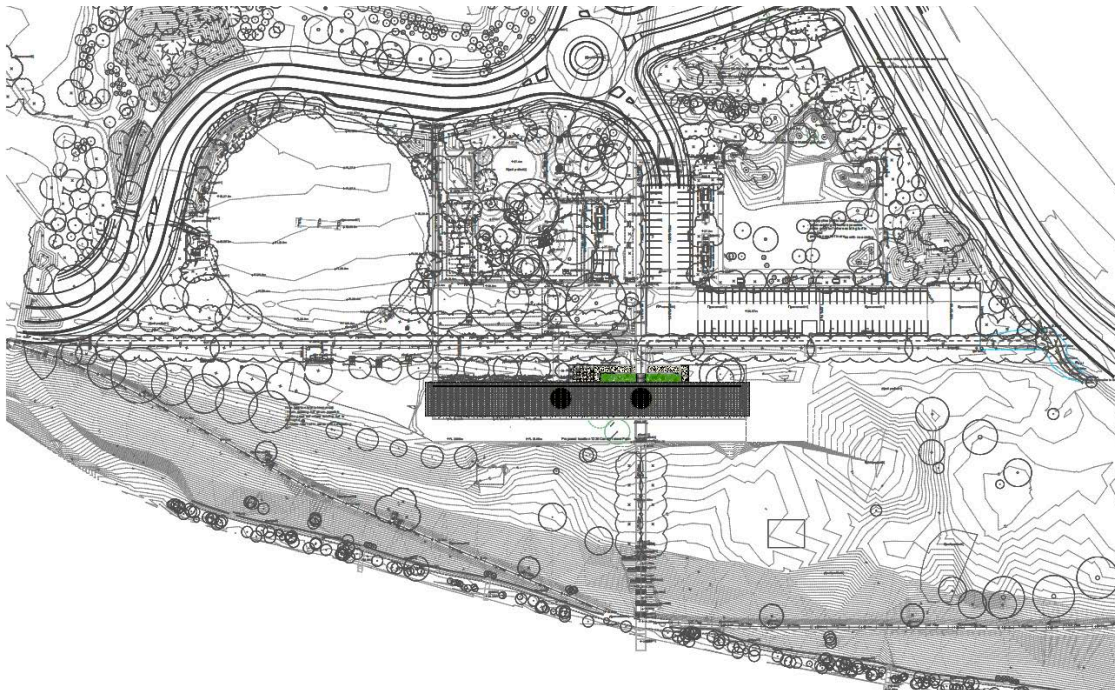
Plan showing the location of the proposed kiosk pavilion.
